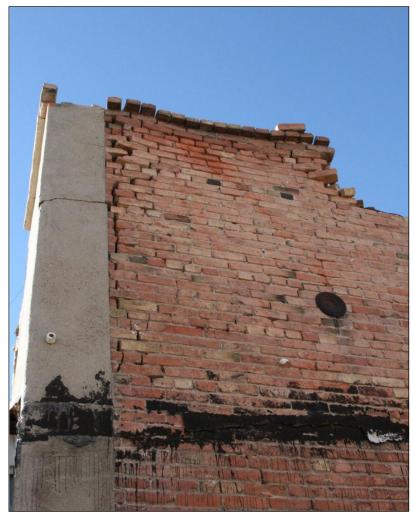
Cracked interface between the undamaged concrete block flag wall and the Goble Market, showing cracking.
